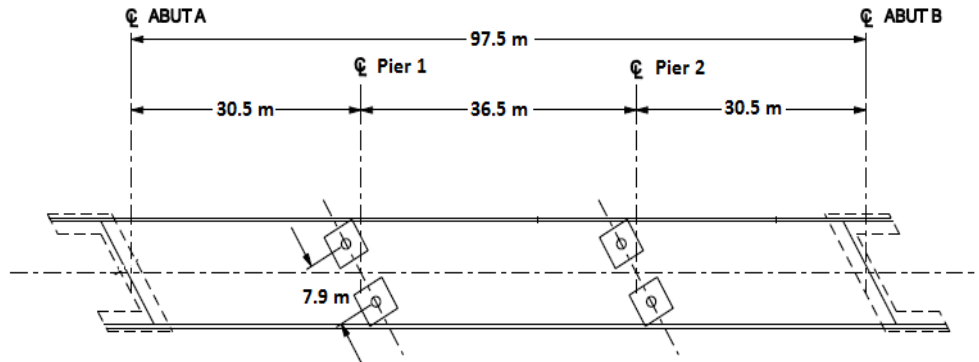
Plan view of the bridge model with same height of piers equal to 6 meter
